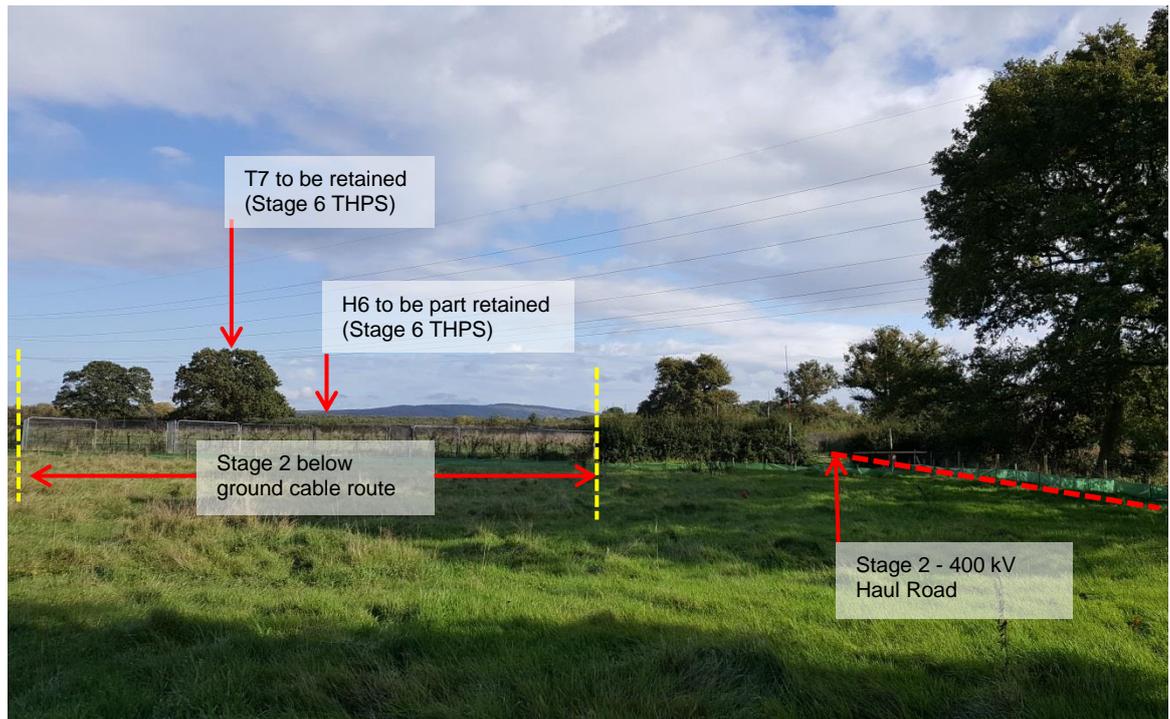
View looking north towards north of Planting Phase Area H from Stage 2 cable route
